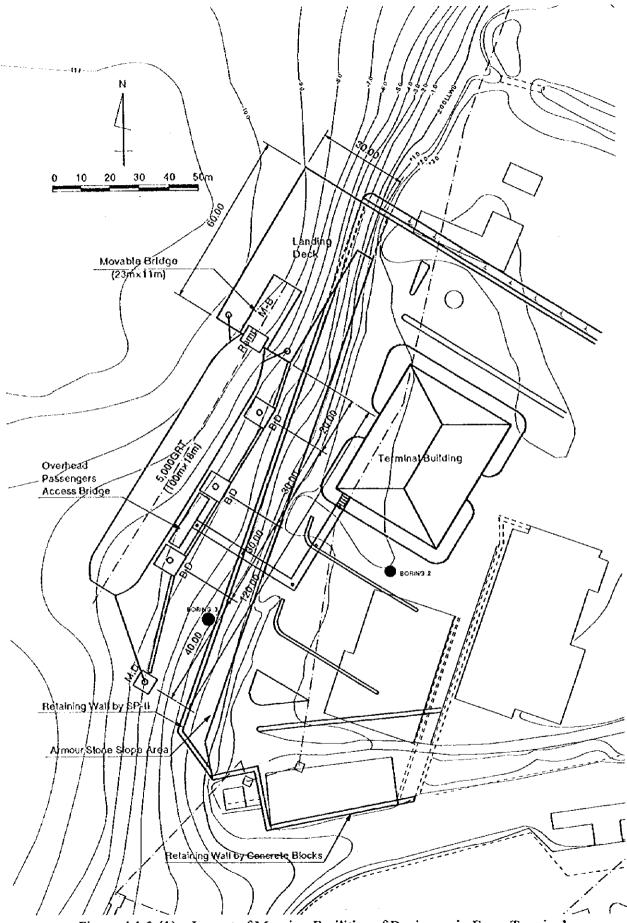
(1) Layout of Mooring Facilities of Banjarmasin Ferry Terminal
